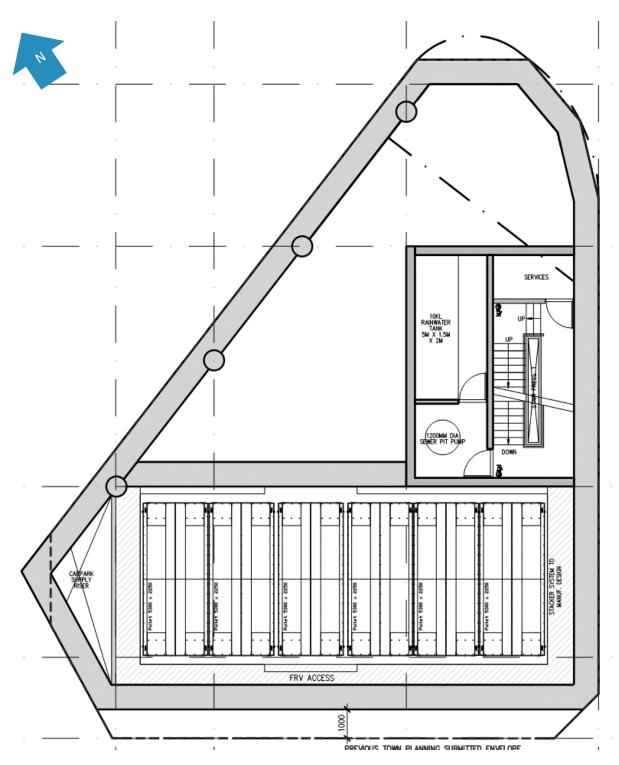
Proposed Floor Plans – Basement 4 (Image Source: Elenberg Fraser)
